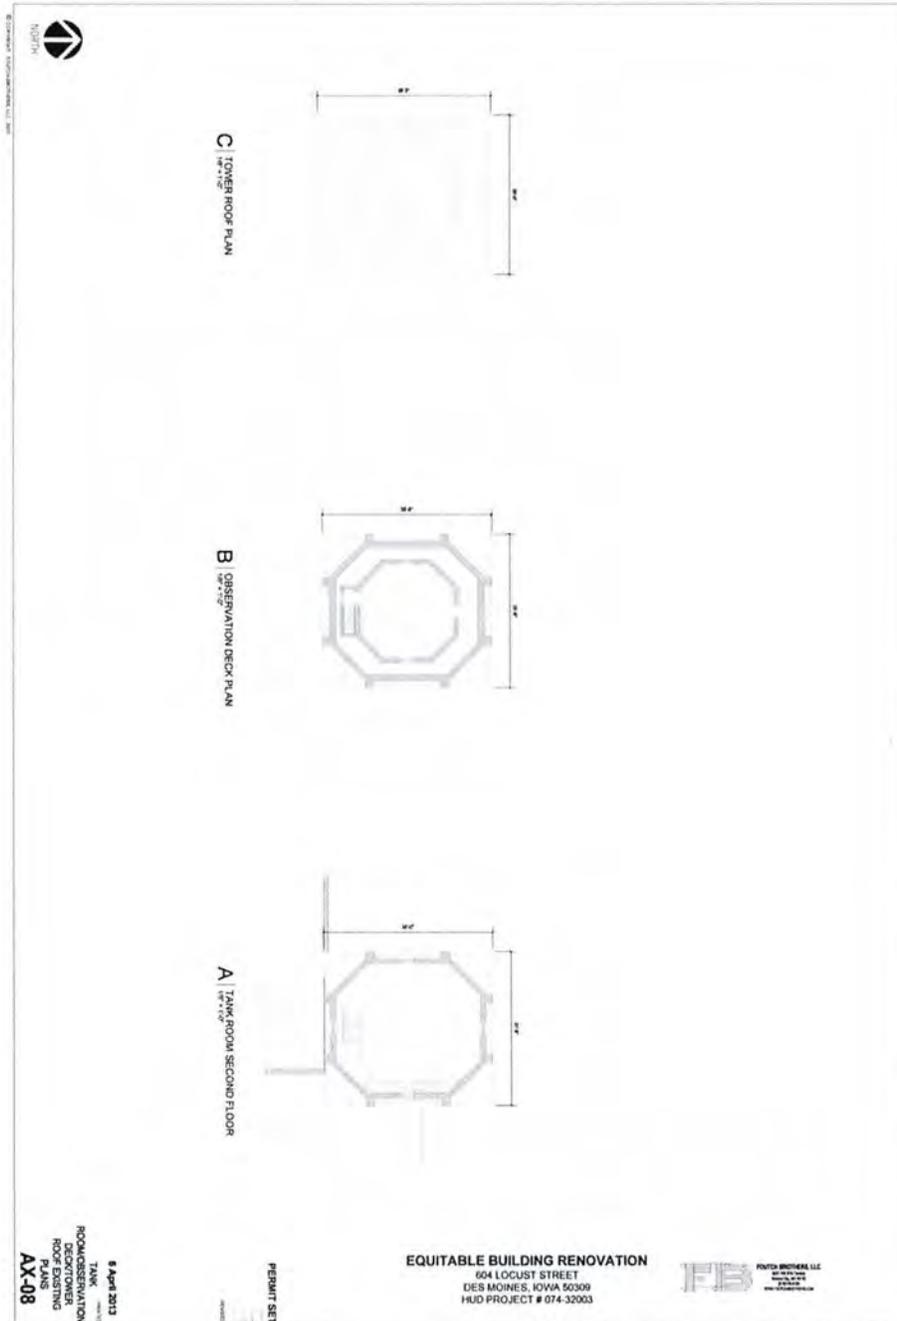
Tank Room, Observation Deck and Tower Roof Existing Plans, drawn by Fouch Brothers, LLC from field measurements.
